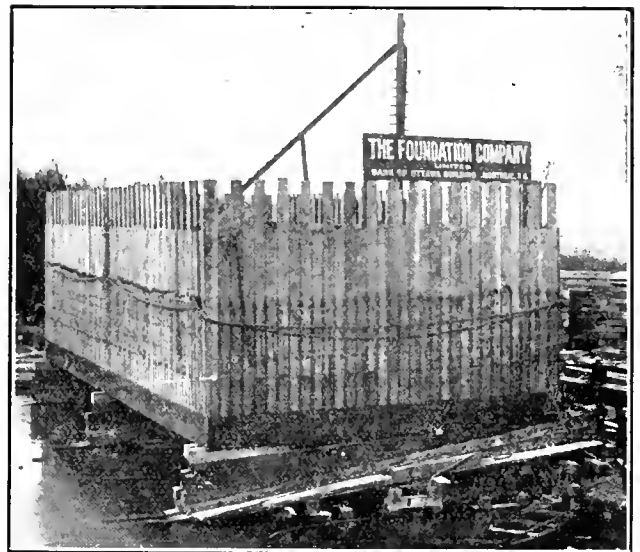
C.P.R. Pitt River Bridge Caisson No. 2, Ready for Launching.
